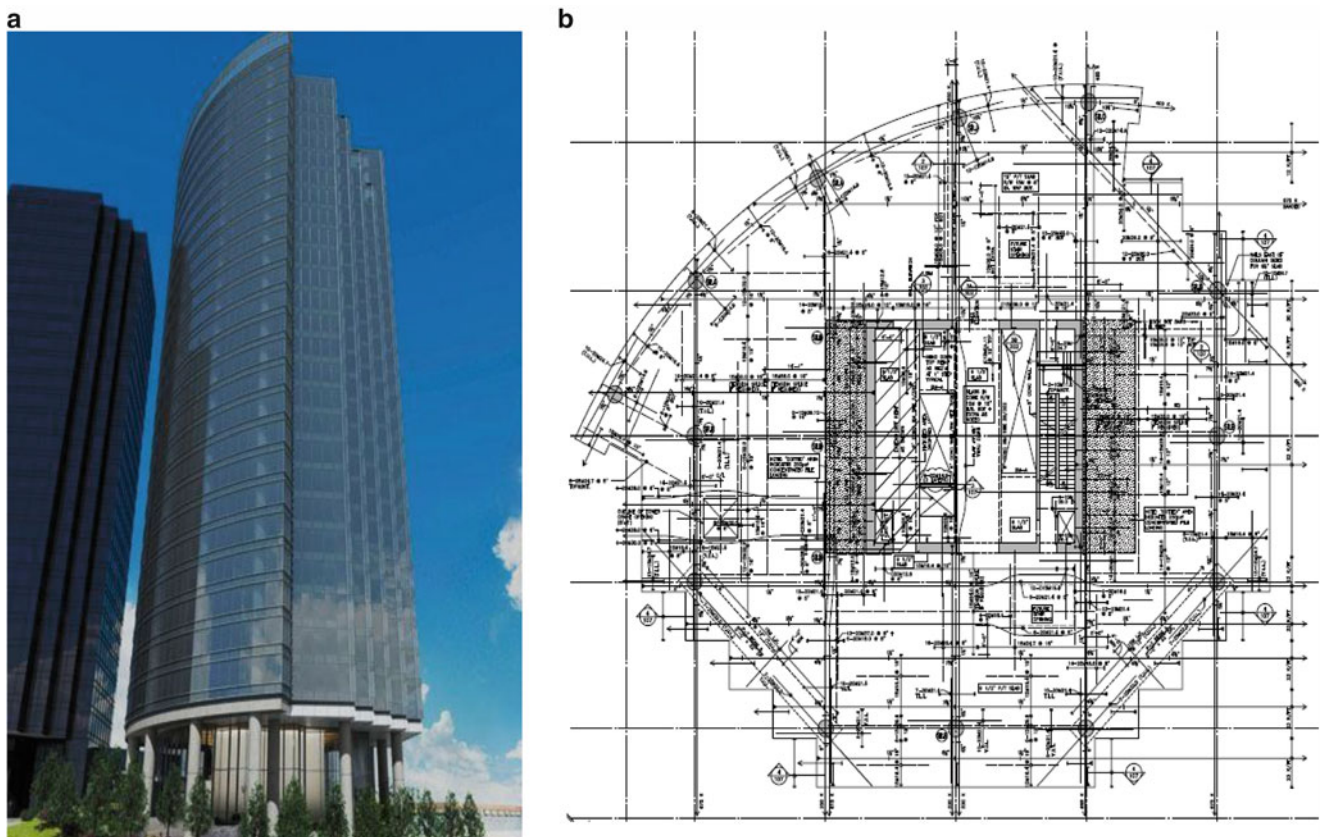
Photo of the investigated building (a) and one of its typical floor plans (b)
